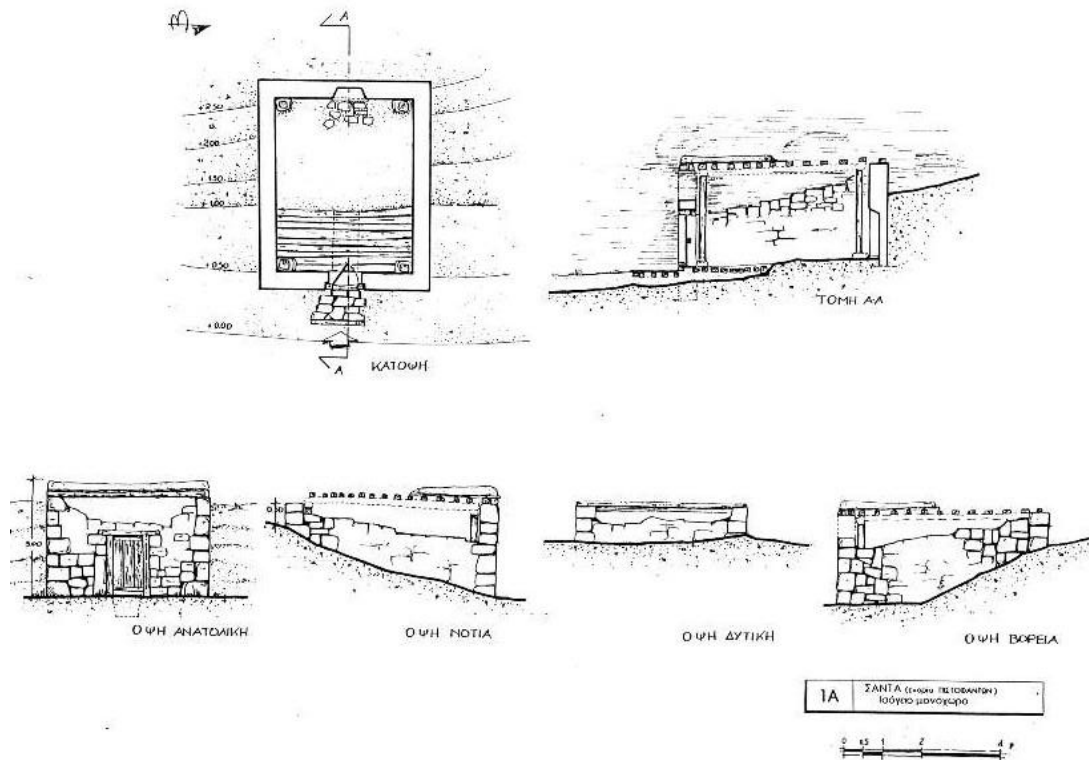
A typical one storey Santa house (Γαβρά 2013, p. 216)
